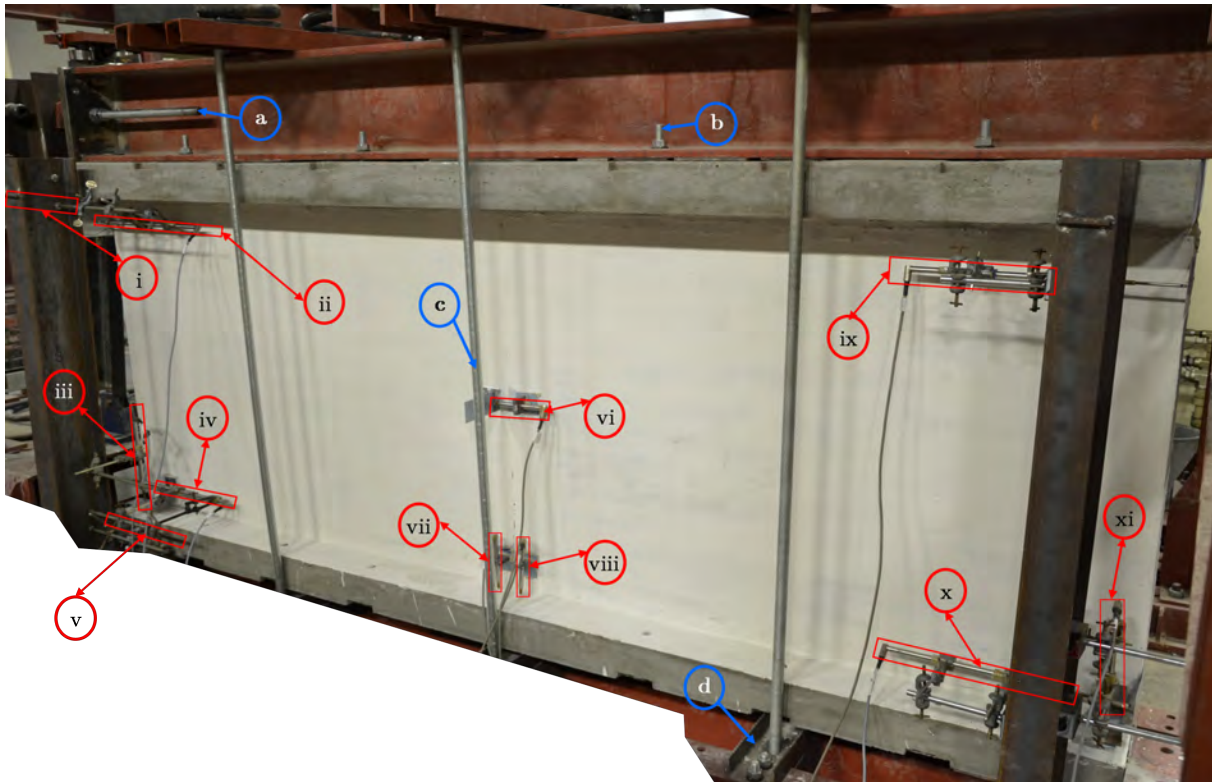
LVDT placement and further lab setup details: (a) Lateral load transfer bar, (b) M18 Shear transfer bolts, (c) 24 mm threaded bar for vertical load application (d) LC positioning bracket as used by (De Beer (2016)), (i) NWC left horizontal top LVDT, (ii) LWFC left panel horizontal top LVDT, (iii) LWFC left panel vertical LVDT, (iv) LWFC left panel horizontal bottom LVDT, (v) NWC left horizontal bottom LVDT, (vi) LWFC vertical connection horizontal displacement LVDT, (vii) LWFC left panel vertical connection vertical displacement LVDT, (viii) LWFC right panel vertical connection vertical displacement LVDT, (ix) LWFC right panel horizontal top LVDT, (x) LWFC right panel horizontal bottom LVDT, (xi) LWFC right panel vertical LVDT
